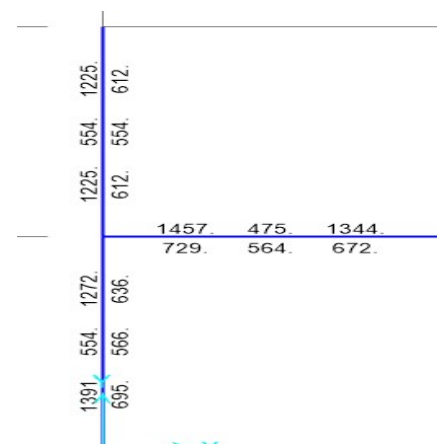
Reinforcement detail of Transverse beam and columns of RC building
